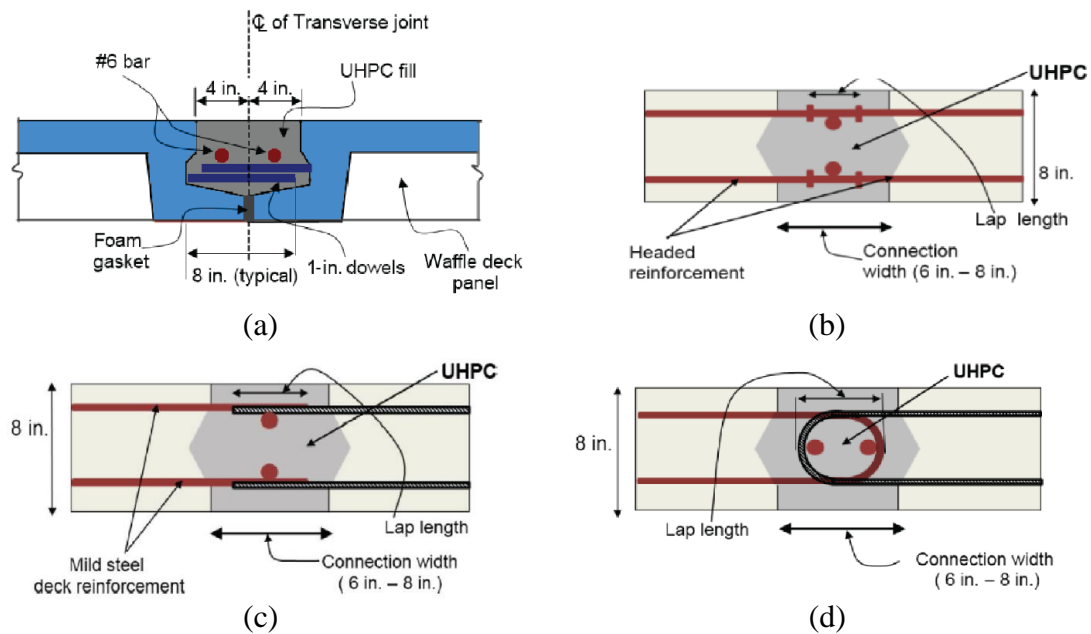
Common panel-to-panel UHPC connection details: (a) waffle deck panel-to-panel connection detail, (b) panel-to-panel headed connection detail, (c) panel-to-panel straight connection detail, and (d) panel-to-panel hairpin reinforcement [62]
